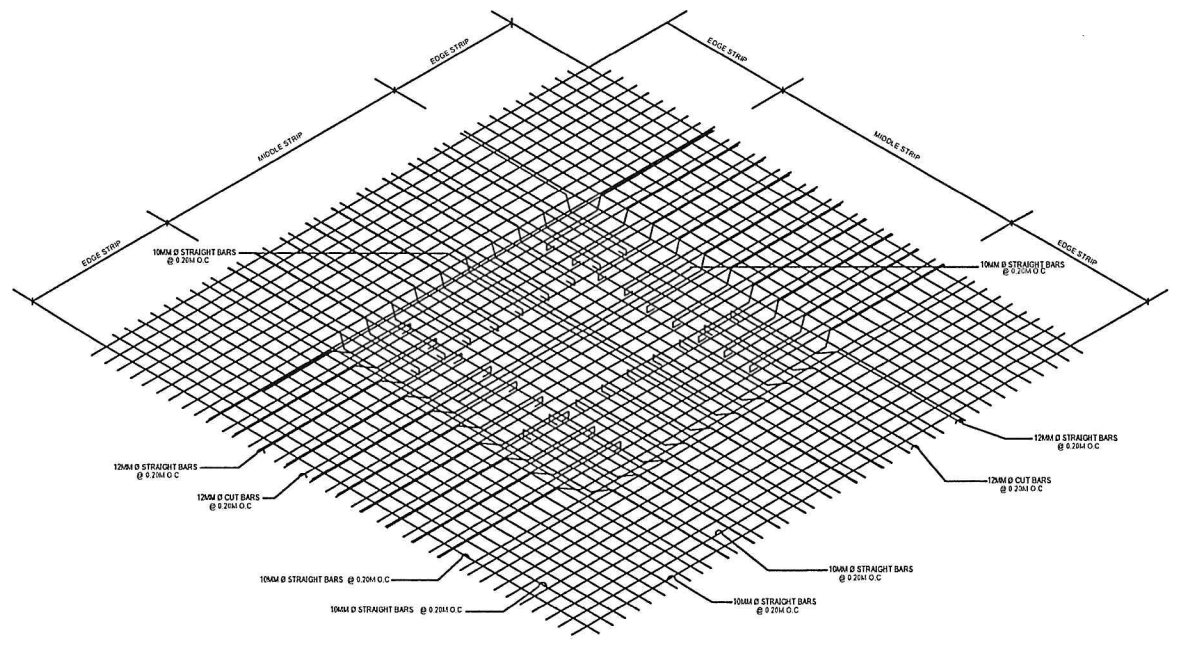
DETAIL OF TYPICAL CONTINUOUS CONCRETE (SECTION A-A) SCALE NTS
